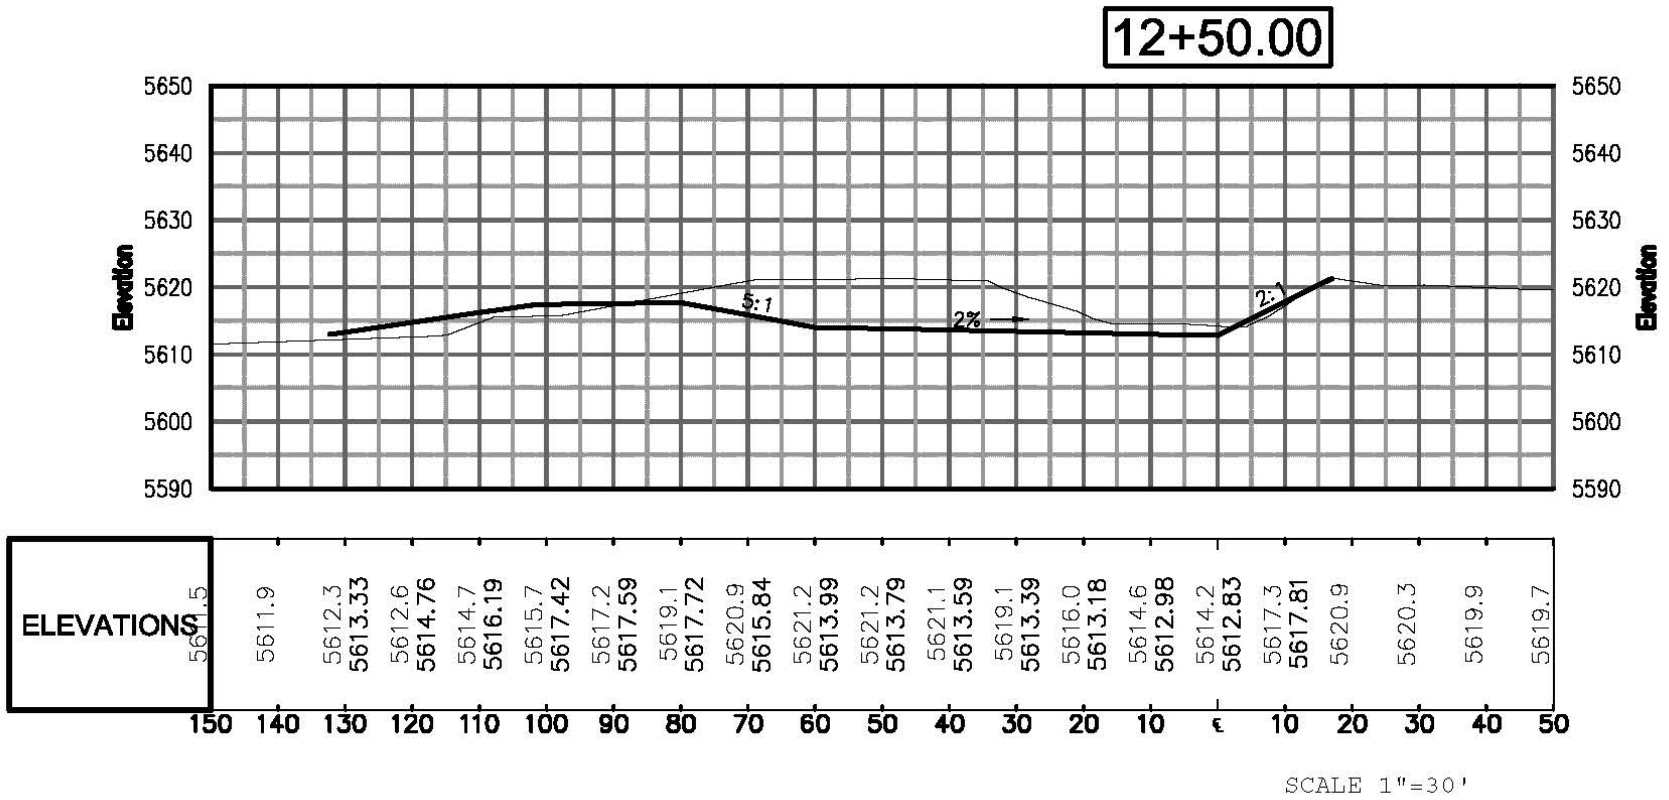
Cross-section of elevations pre-construction (light grey) and post-construction (black) at Station 12+50
